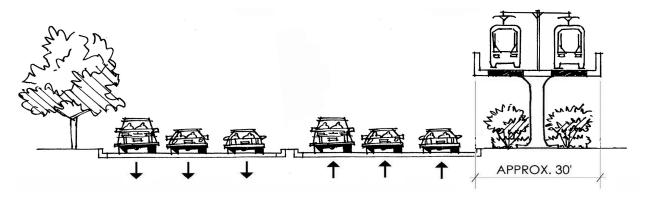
Exclusive Guideway, Type A – aerial structure, arterial street
